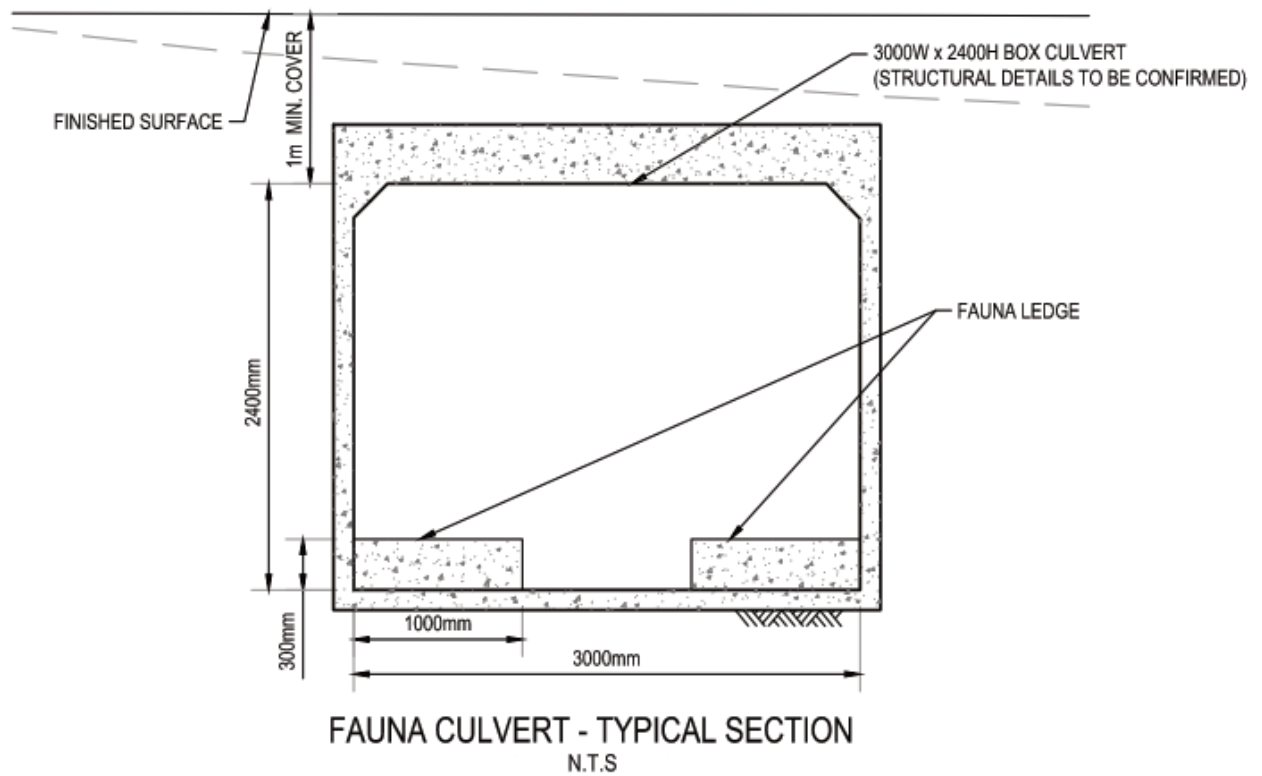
Cross section of the proposed culvert at Surveyors Creek
